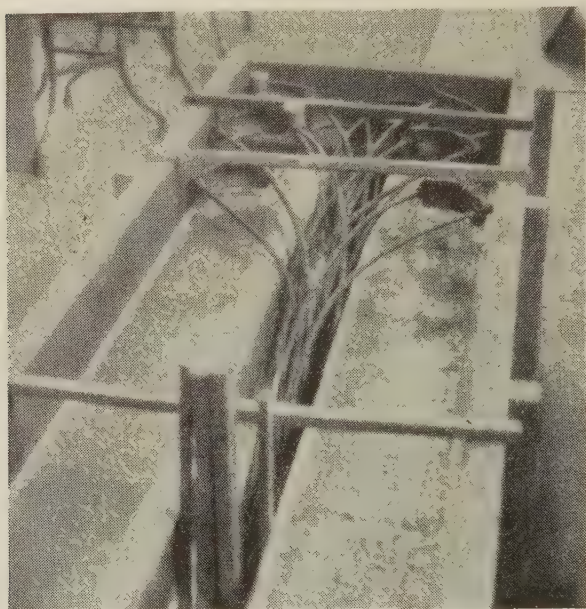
SCOTT SYSTEM OF BENDING AND ANCHORING BARS
